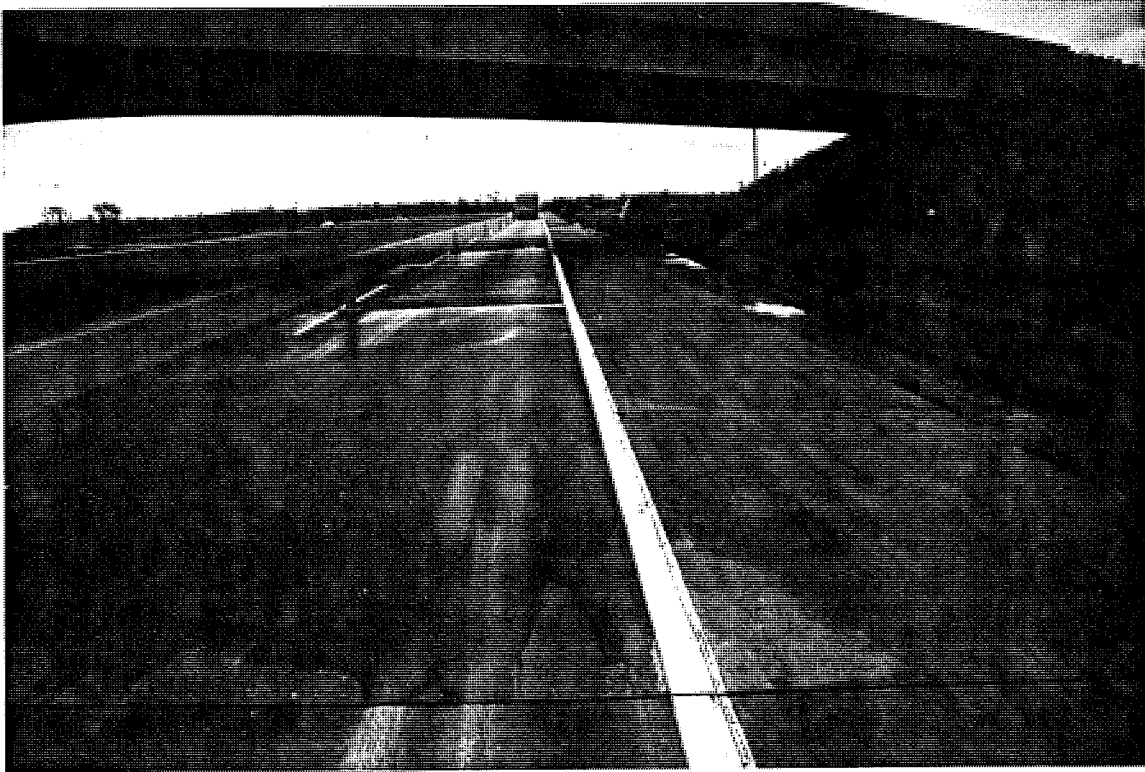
An overview looking east on CSN# 77024-17988A (Section B), EB. The third point intermediate shoulder joints can be seen. Slabs are 41 ft long in the driving lanes.
